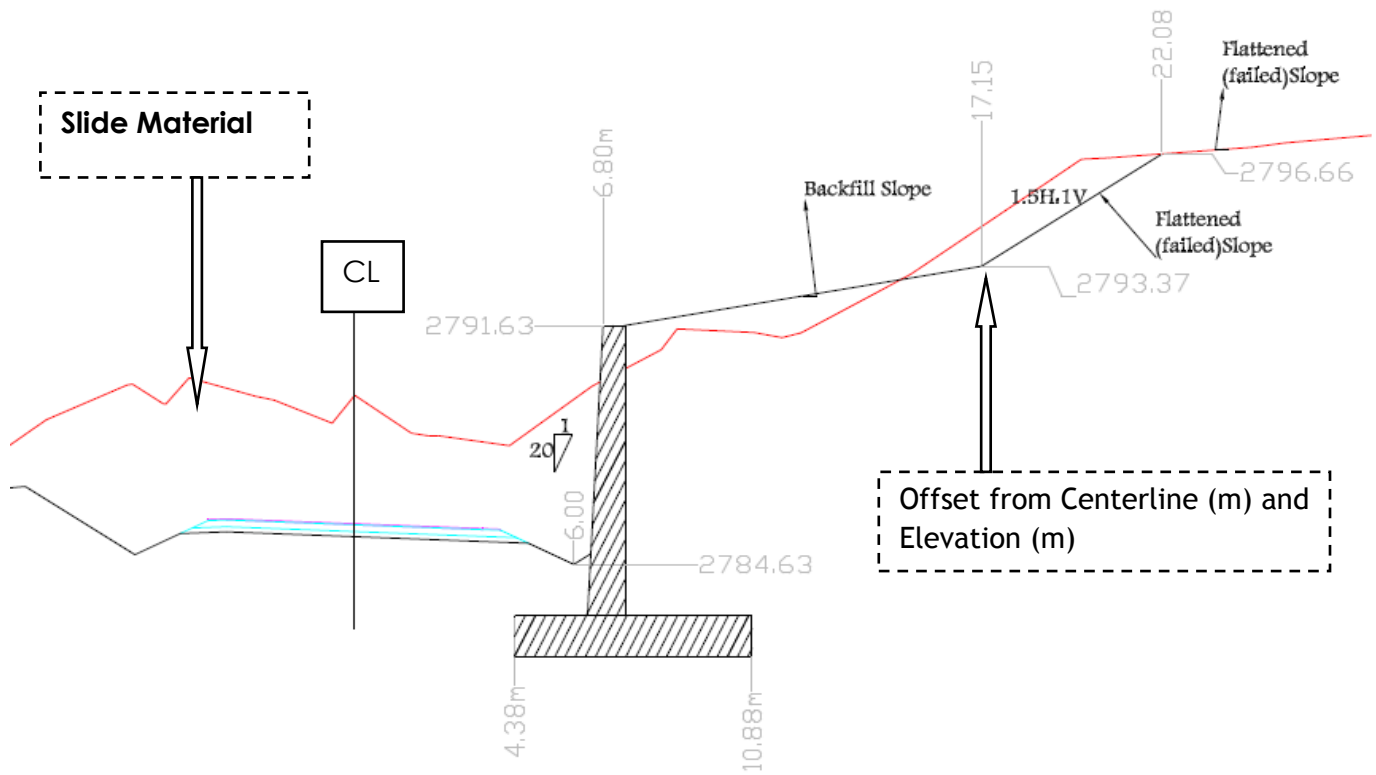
Typical Drawing of cantilever retaining wall at Sta.68+080RHS
